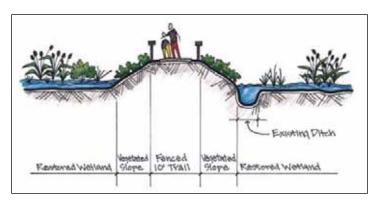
Cross-section of trail through proposed wetland restoration area
